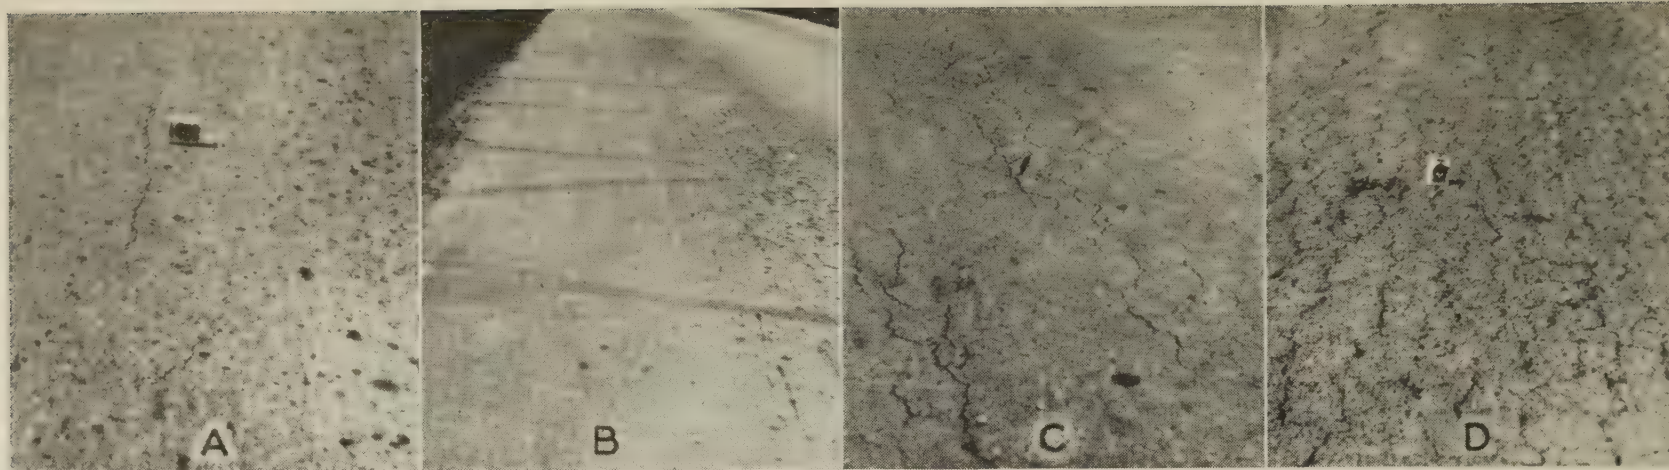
Pavement performance: (A) Isolated longitudinal cracks; (B) isolated transverse cracks; (C) map cracking and breakage; and (D) complete failure.
